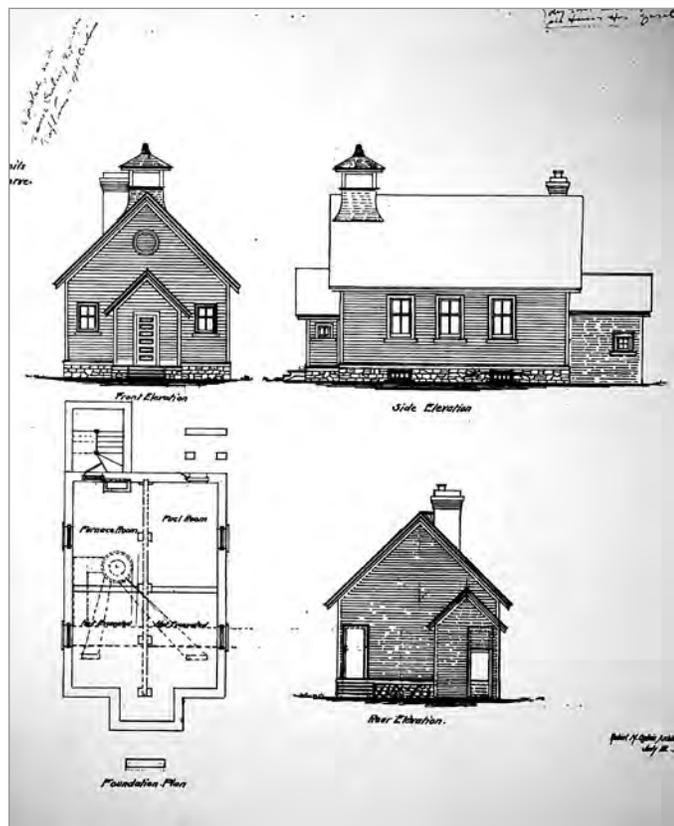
ARCHITECTURAL PLAN: DAY SCHOOL FOR 50 STUDENTS, 1904, R.M. OGILVIE, ARCHITECT. ELEVATIONS AND FOUNDATION PLAN. | © INDIAN AND NORTHERN AFFAIRS. REPRODUCED WITH THE PERMISSION OF THE MINISTER OF PUBLIC WORKS AND GOVERNMENT SERVICES CANADA, 2009. SOURCE: LIBRARY AND ARCHIVES CANADA / INDIAN AND NORTHERN AFFAIRS / RG22M 77803 / 111 ITEM 229.
